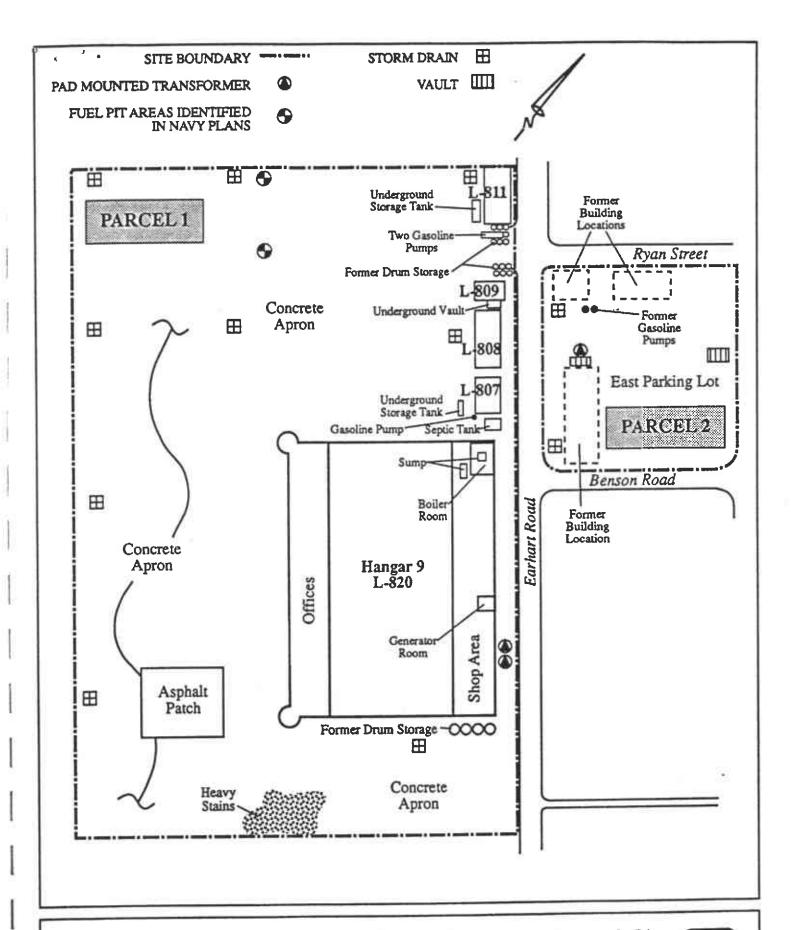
Hangar 9 Site Plan (Parcels 1 and 2)
